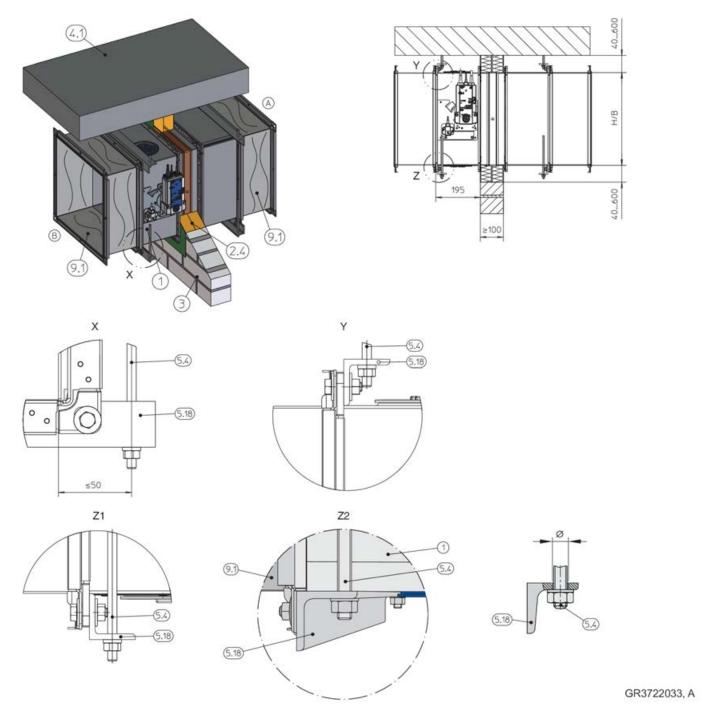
Fixing of FKA2-EU, wall installation with a fire batt
